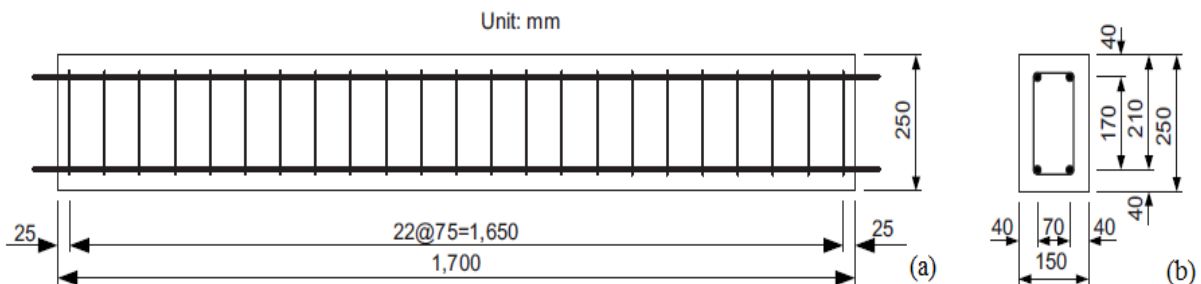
Rebar arrangement: (a) side view; (b) cross-sectional view (Fujikake, et al., 2009).
